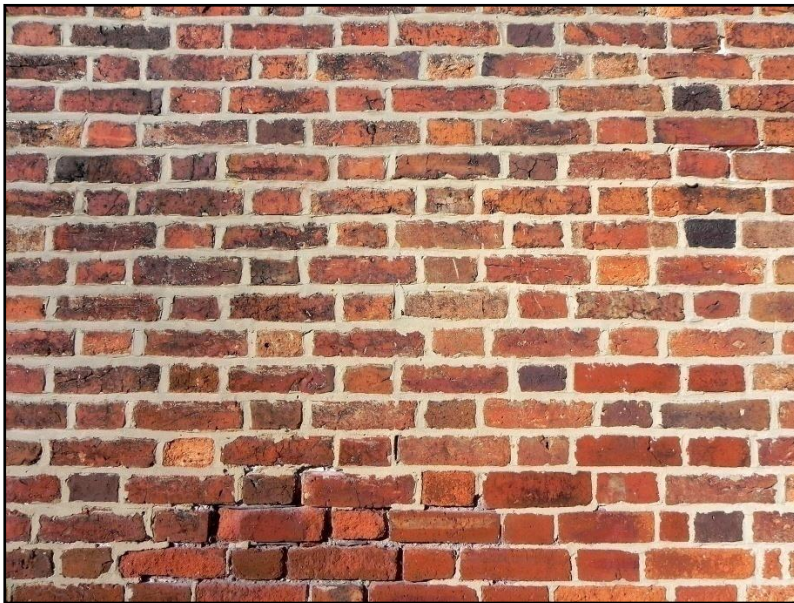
The blocked-up window in the west wall, which provides stratigraphy between the buildings.
